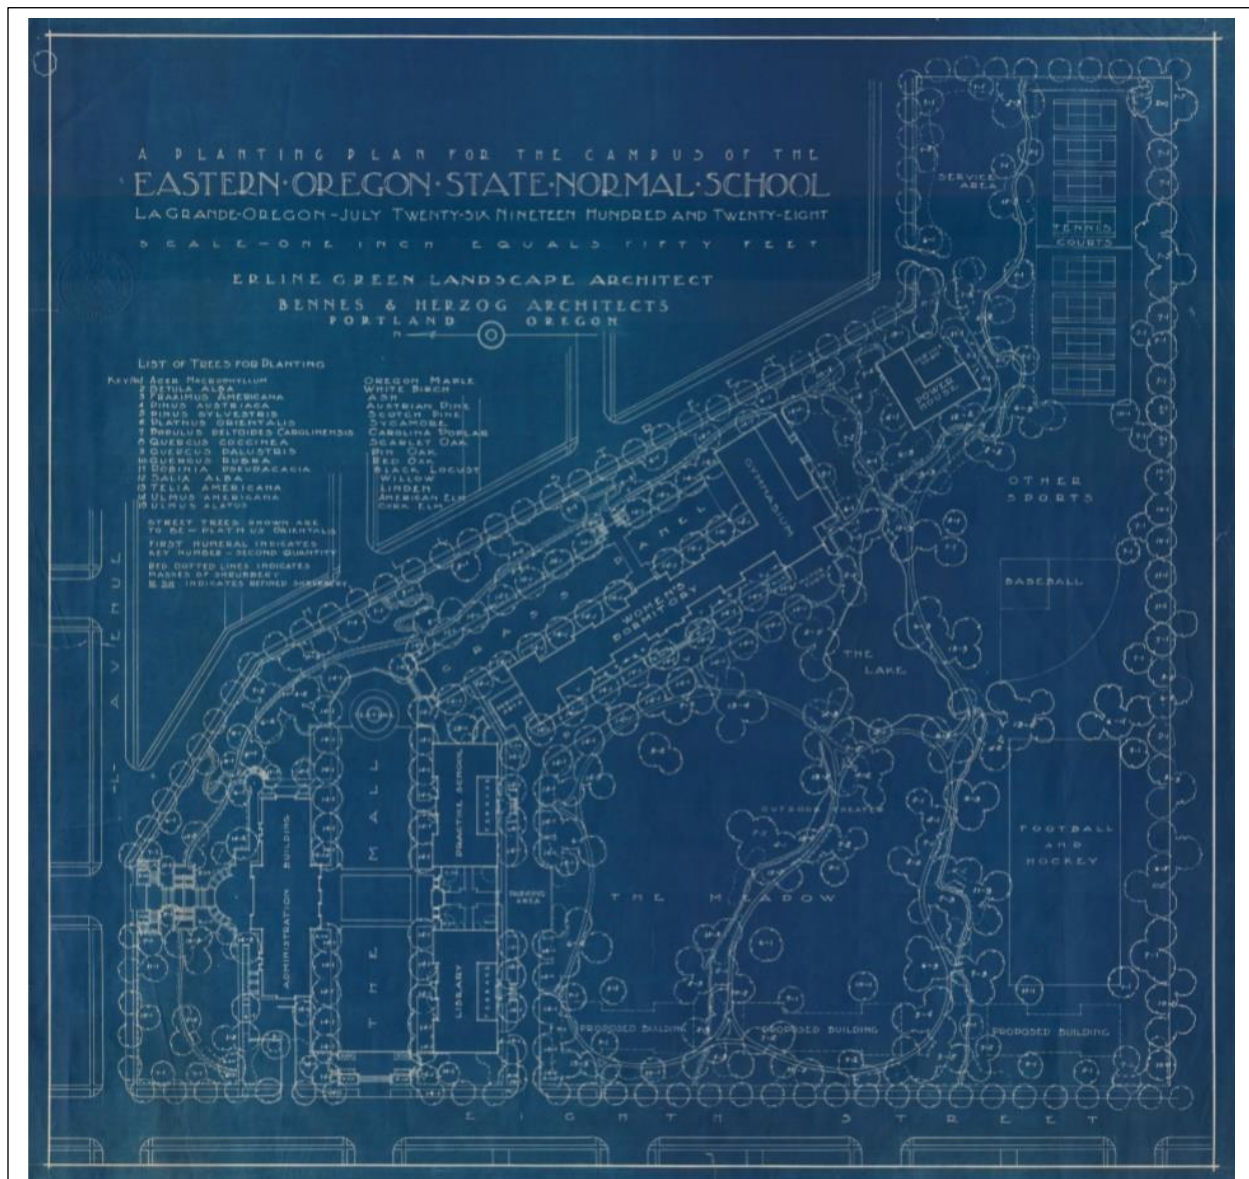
Campus landscape and planting plan for Eastern Oregon State Normal School, La Grande. Erline Green, Landscape Architect. 1928. Source: EOU Facilities Management Collections
